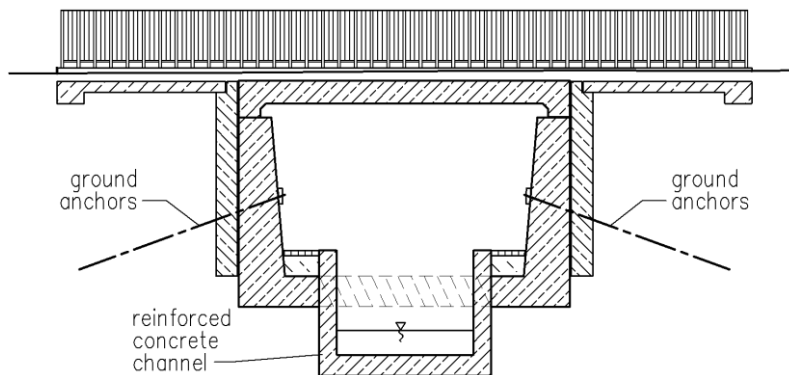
Bridge with reinforced concrete channel cut out in the floor bedplate
